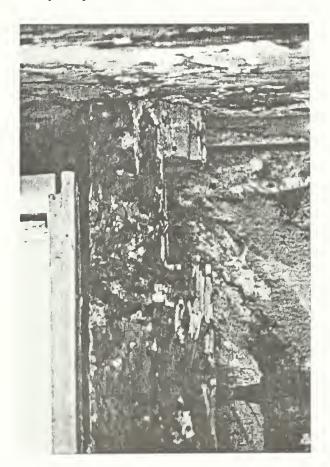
West India Goods Store, interior of second story, south wall, showing stud with cut to receive possible window head.
